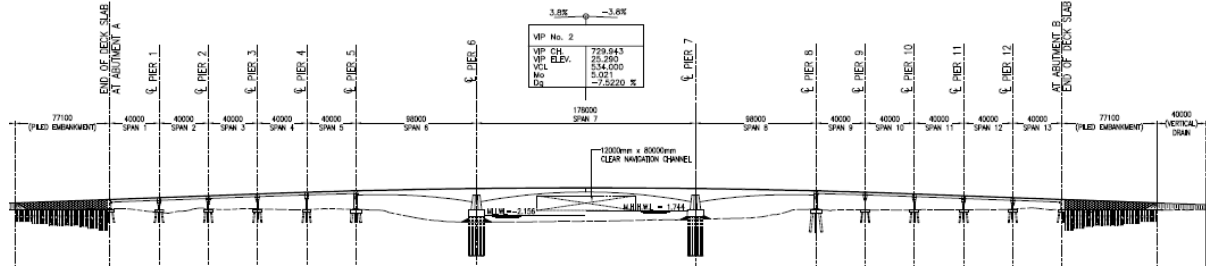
Longitudinal Section of Batang Samarahan Bridge
